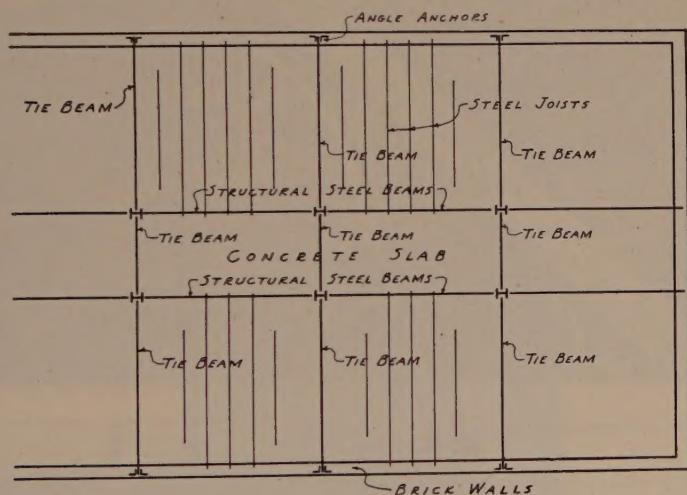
IMPROVED LAYOUT FOR SUPPORTS FOR STEEL JOISTS
